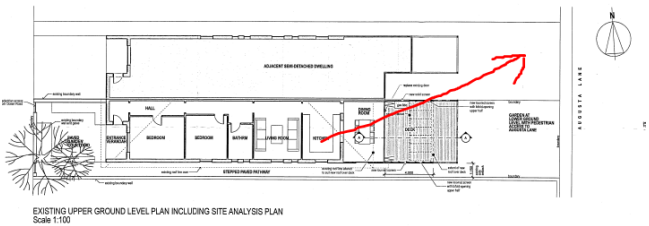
Plan from DA151/10 - Alterations and additions to an existing dwelling including a roof over existing deck and privacy screens approved 13 July 2010 by Manly Council (Red pen indicates view corridor raised in objection to the proposed development by 26 Ocean Road)
